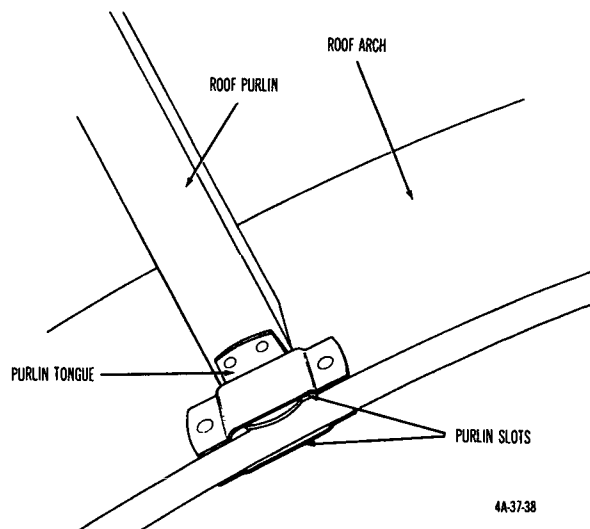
Installing roof purlins in tent, frame-type, insulated, sectional.
